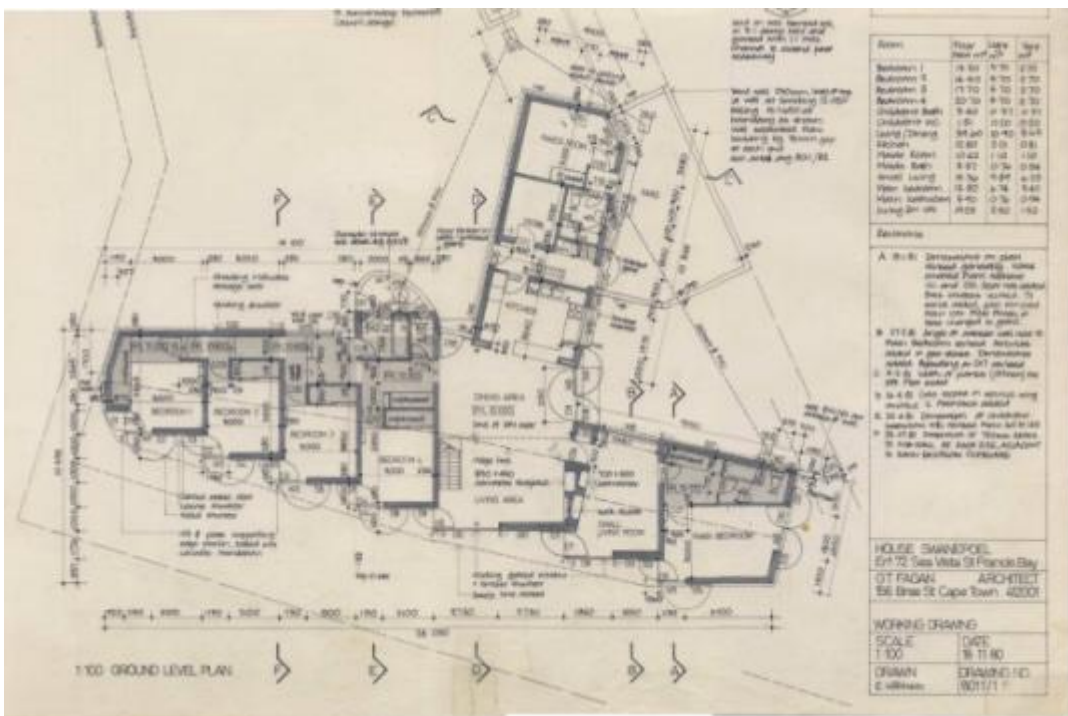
Part working drawing showing plan (Fagan archive - Job No. 8011, 18/11/1980).
